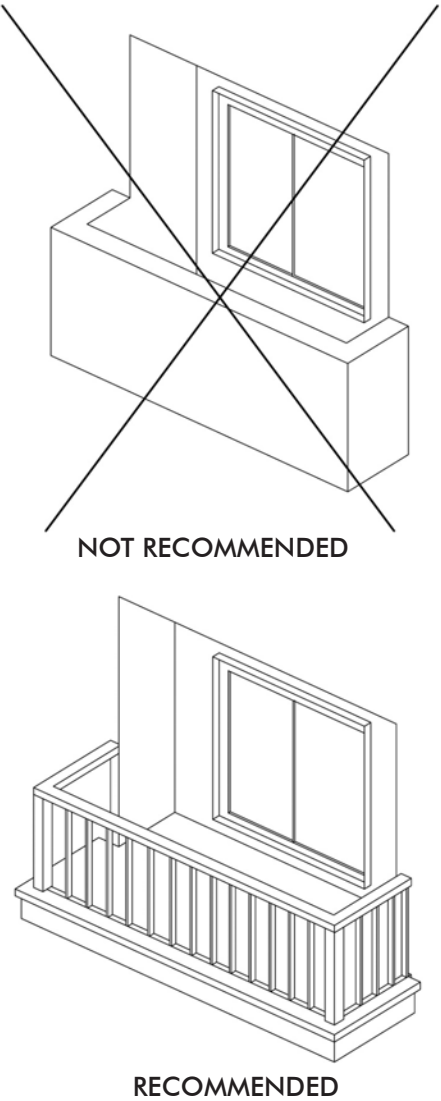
A.10.D.II TREATMENT OF BARRIER RAILINGS
